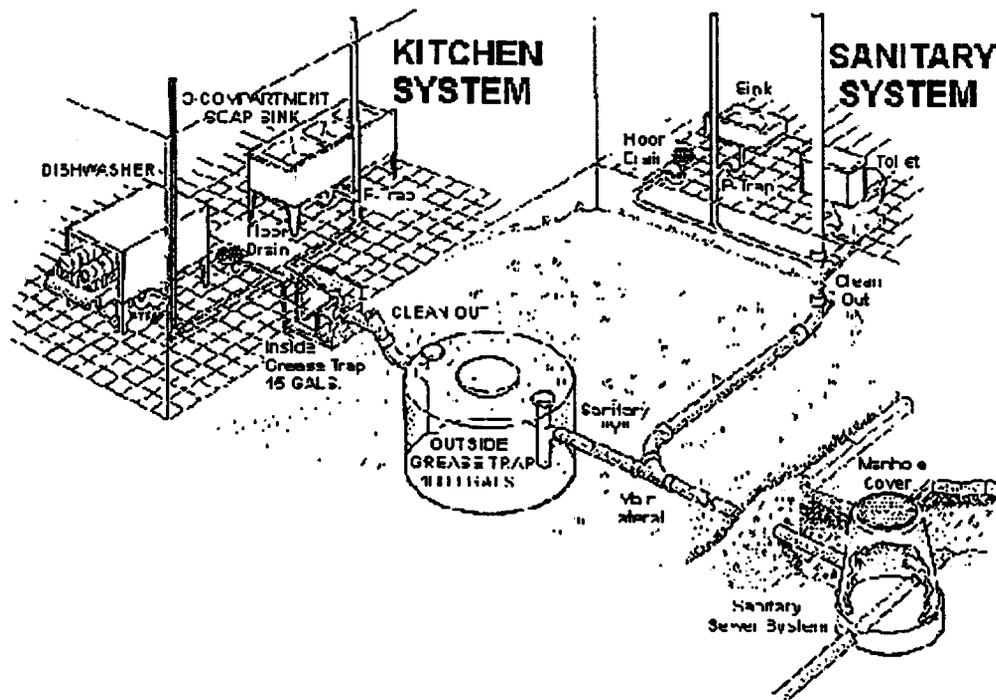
Typical Wastewater Disposal Unit with separate systems for Sanitary and Kitchen (adapted from Russellreid.com)
